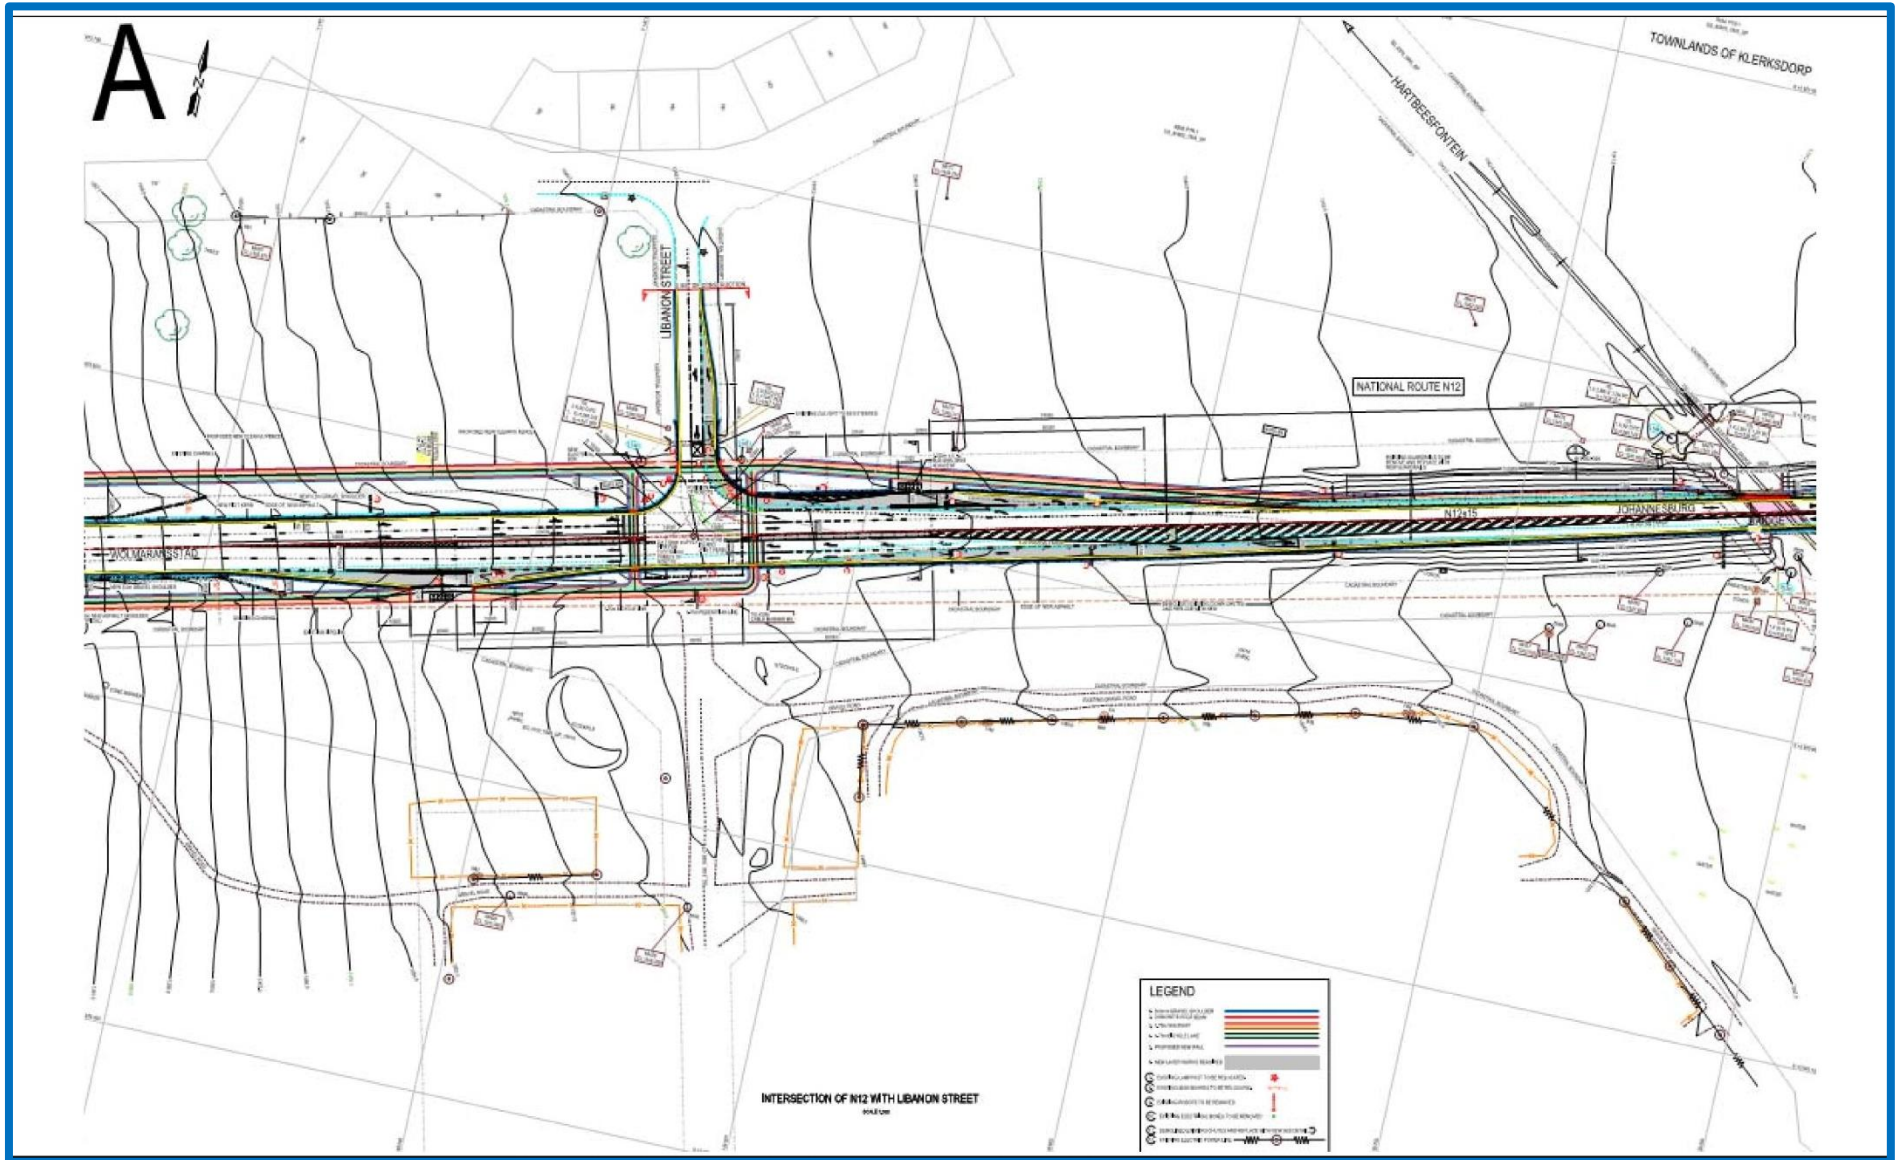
Road N12 and Libanon Street intersection (Point 1) upgrade by SANRAL
